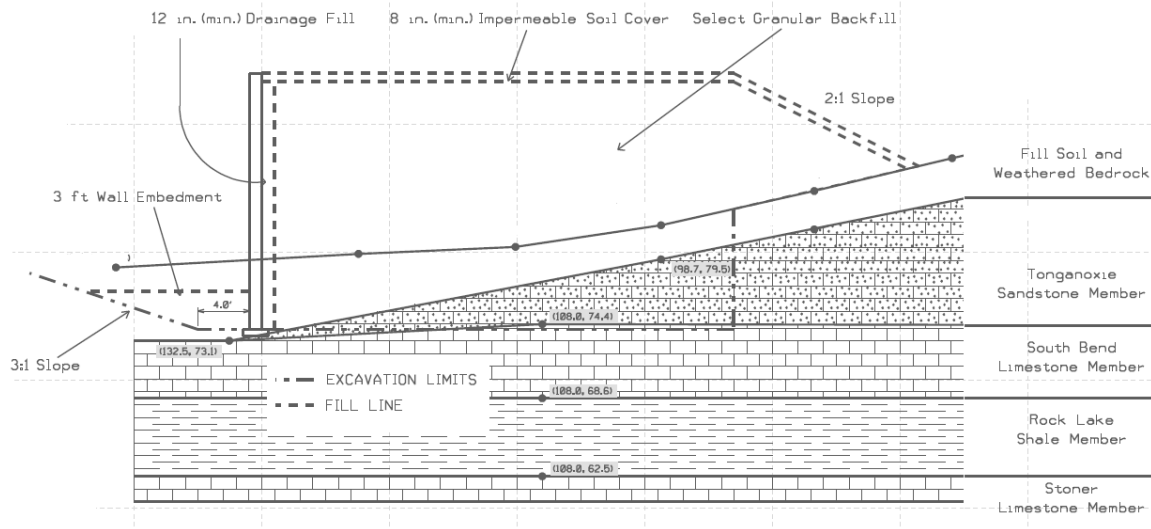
Proposed cross section of MSE wall and subsurface (KDOT, 2007)
